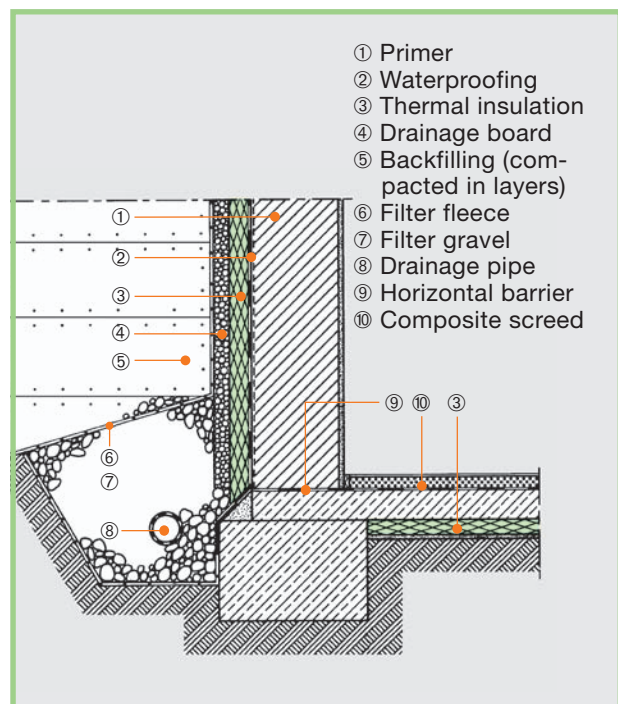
Arrangement of perimeter insulation combined with drainage system.
